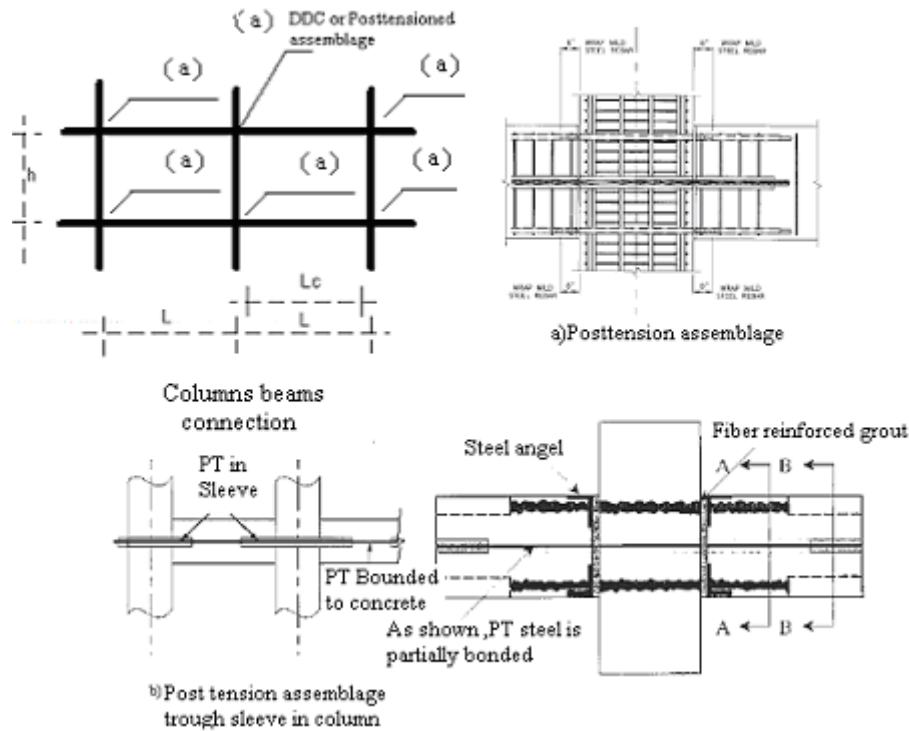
Details of post-tensioned connection, and alternative post tensioned assemblage through sleeve in column.
